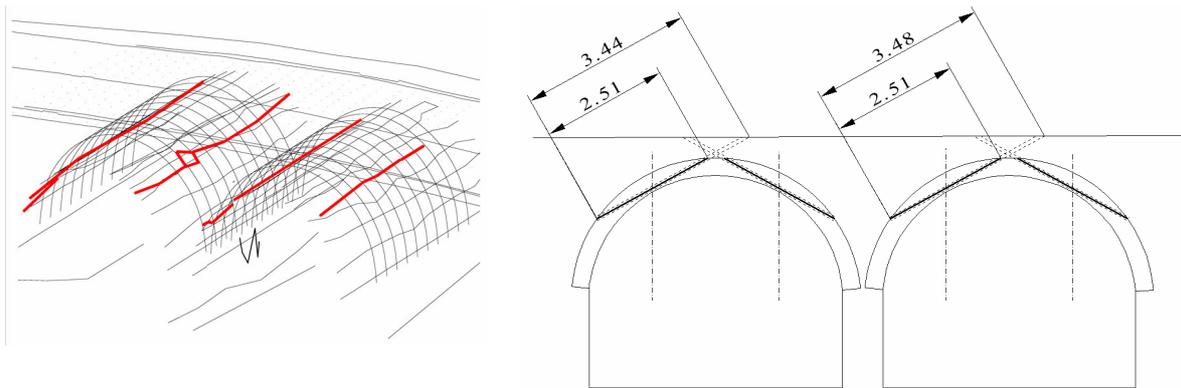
Transverse Crack Locations and Proposed Archtec Strengthening
